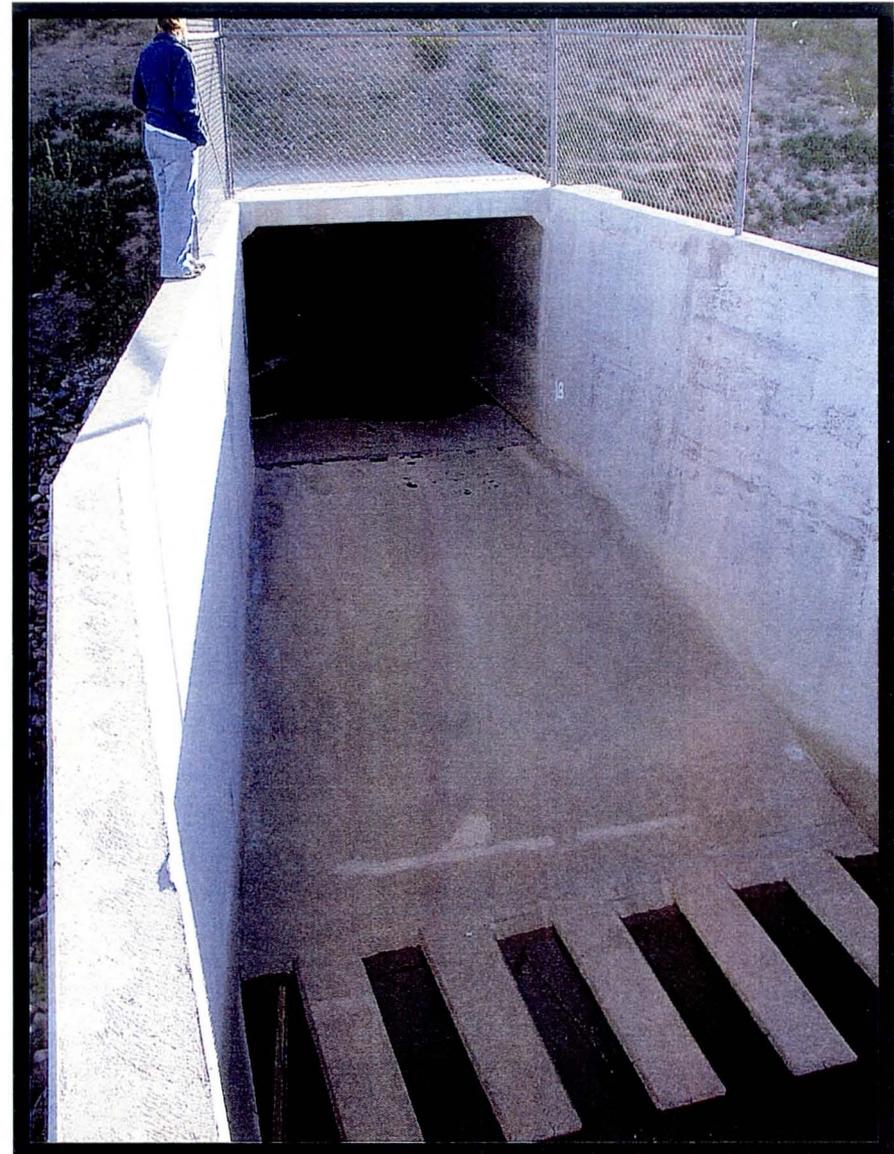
Saddleback FRS Principal Outlet and Energy Dissipator.
